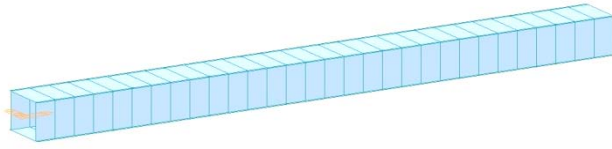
FEM Model Of Bridge Superstructure (Box Girder)
